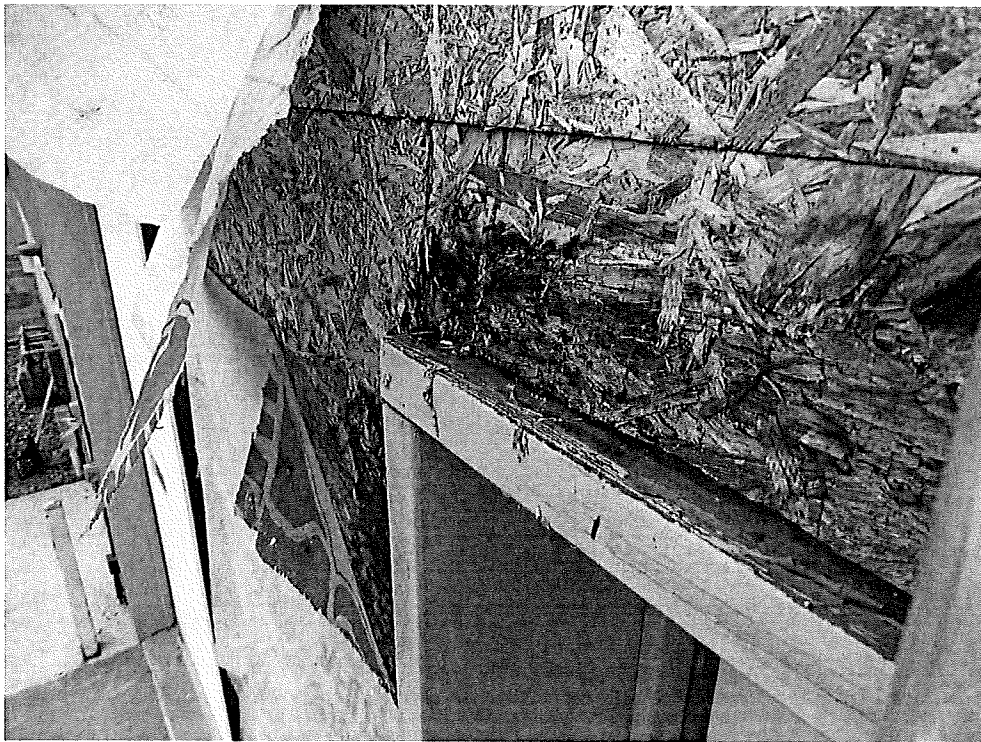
Flashing atop brick at South Elevation (SW Corner)
